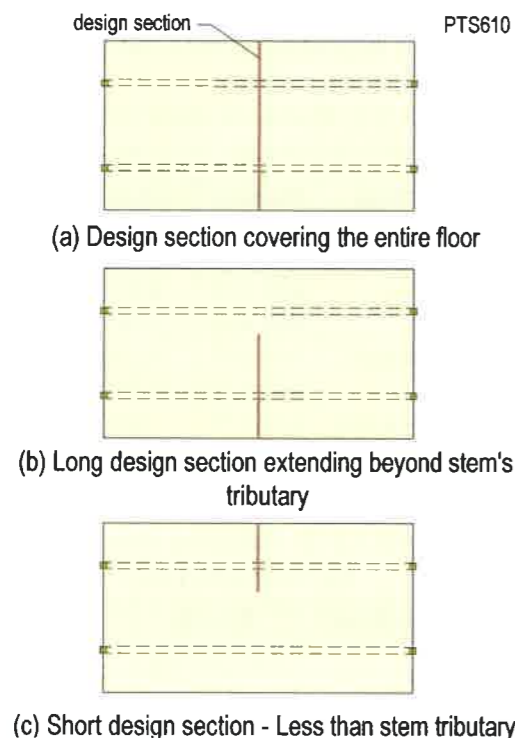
Design Sections of Different Widths
